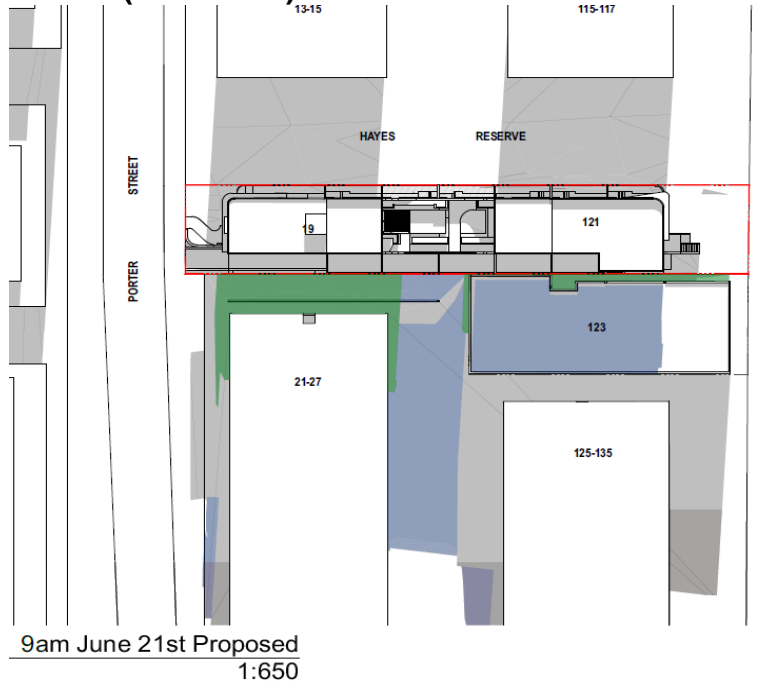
Shadow diagram of overshadowing at 9am from subject site with shadows from the existing buildings (green) and proposed development (blue).
